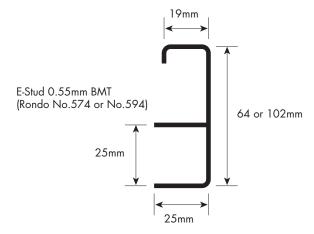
Shaft Wall Framing Components Shaft Wall E-Stud
